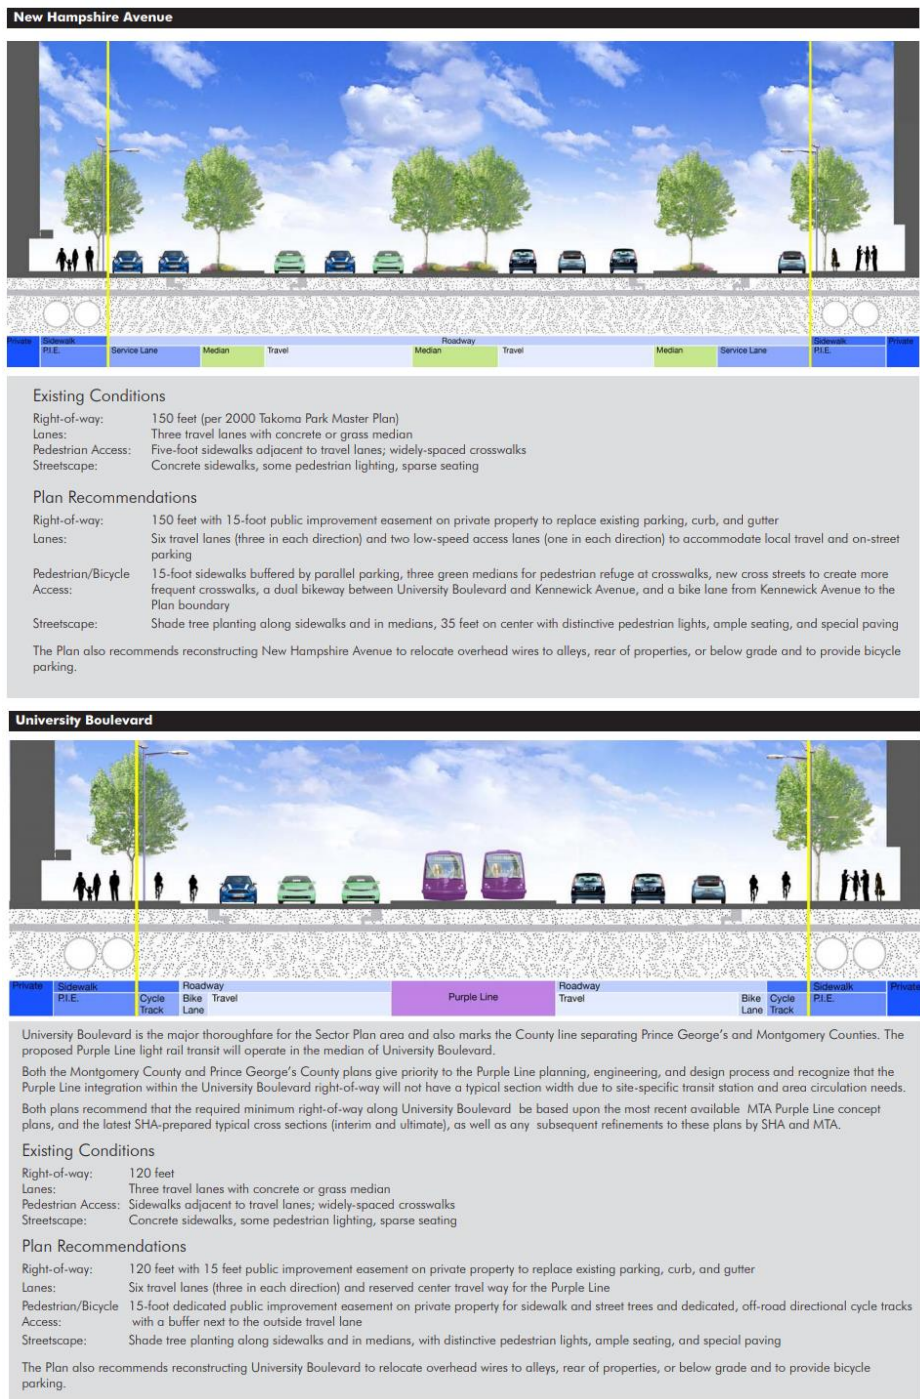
Streetscape Existing Conditions and Plan Recommendations
